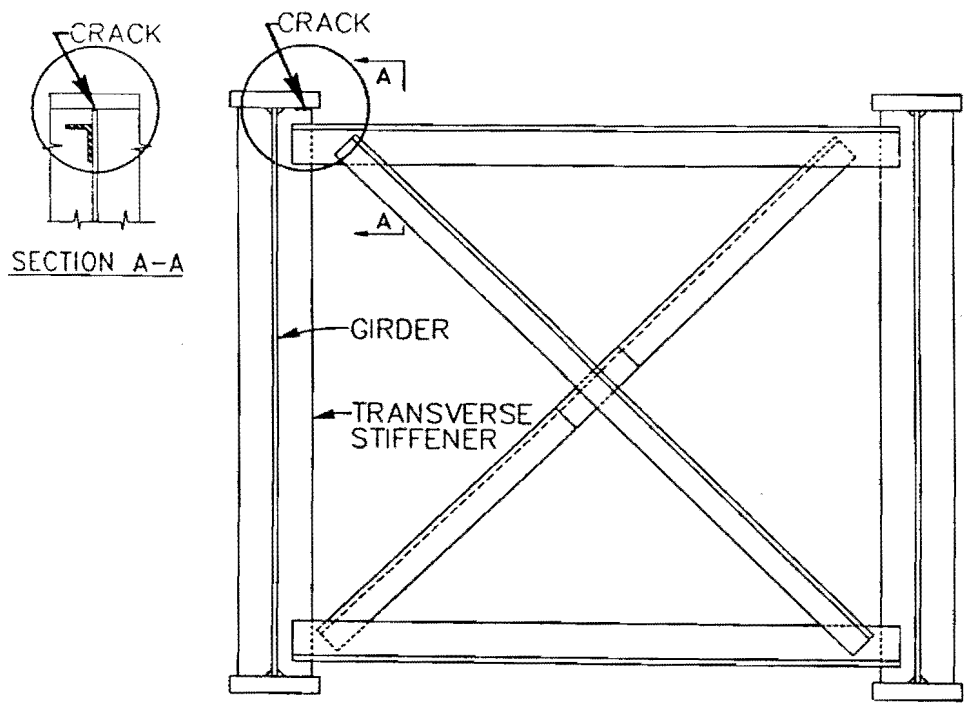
Typical location of Type A3 fatigue cracking.
